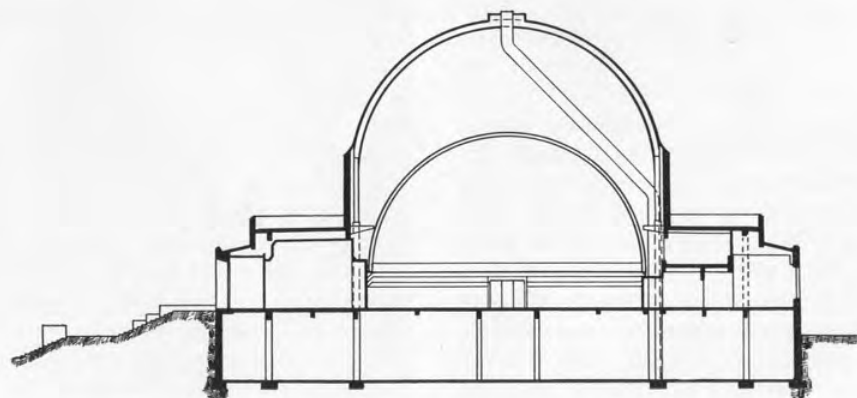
CROSS-SECTION OF THE BUILDING IN ELEVATION.
